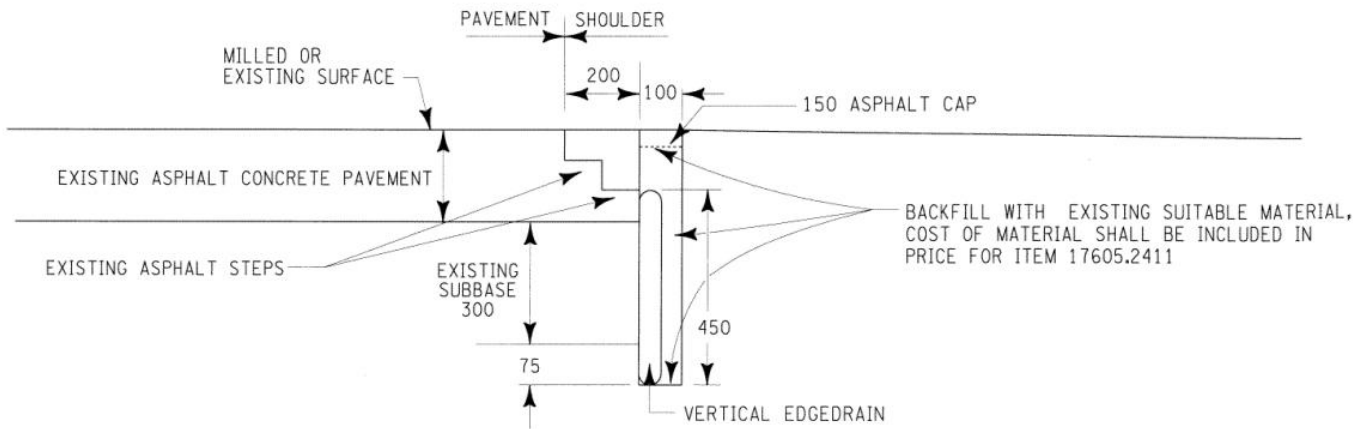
PGED with Existing Suitable Material Detail Adjacent to Asphalt Pavement
